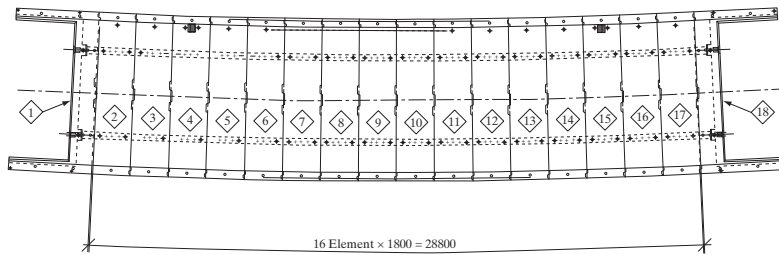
General arrangement of the prefabricated bridge deck in road bridge AC1684 (Units: mm)
